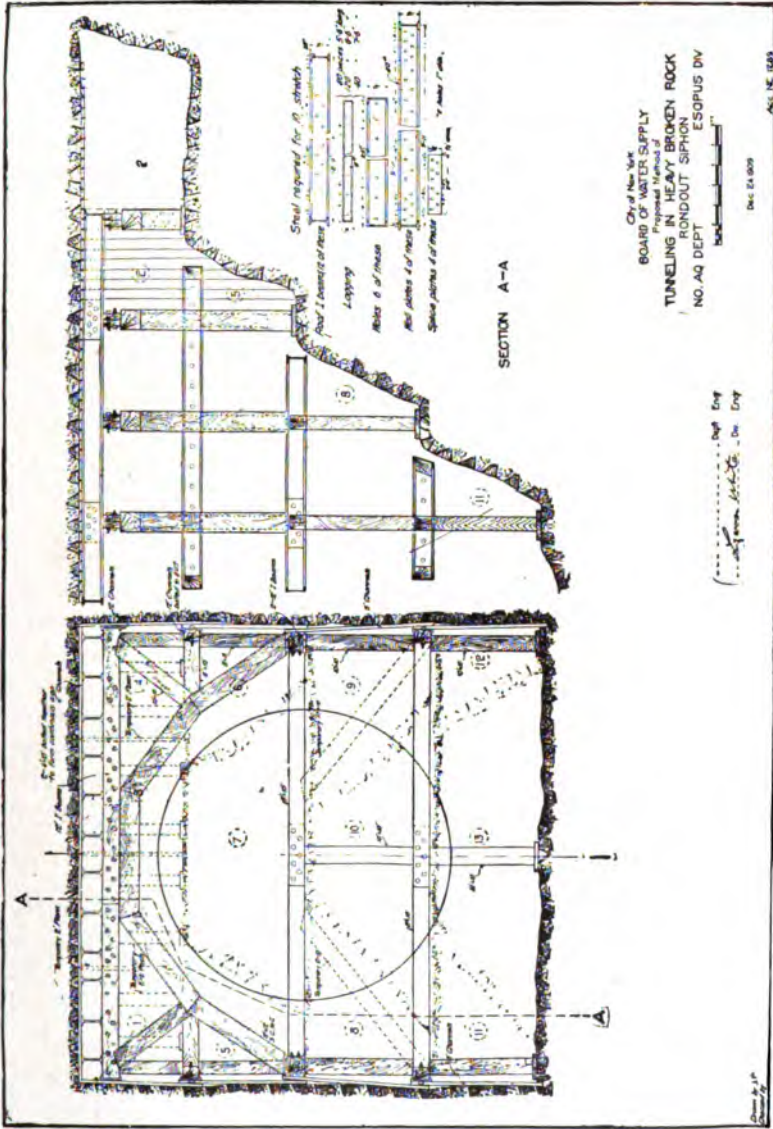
Contract 12. System of Timbering, Using I-beams and I's Supported by Temporary Timber Arch as Used in Heavy Broken Limestone. Steel concreted in with lining, but timbers removed before concreting.
